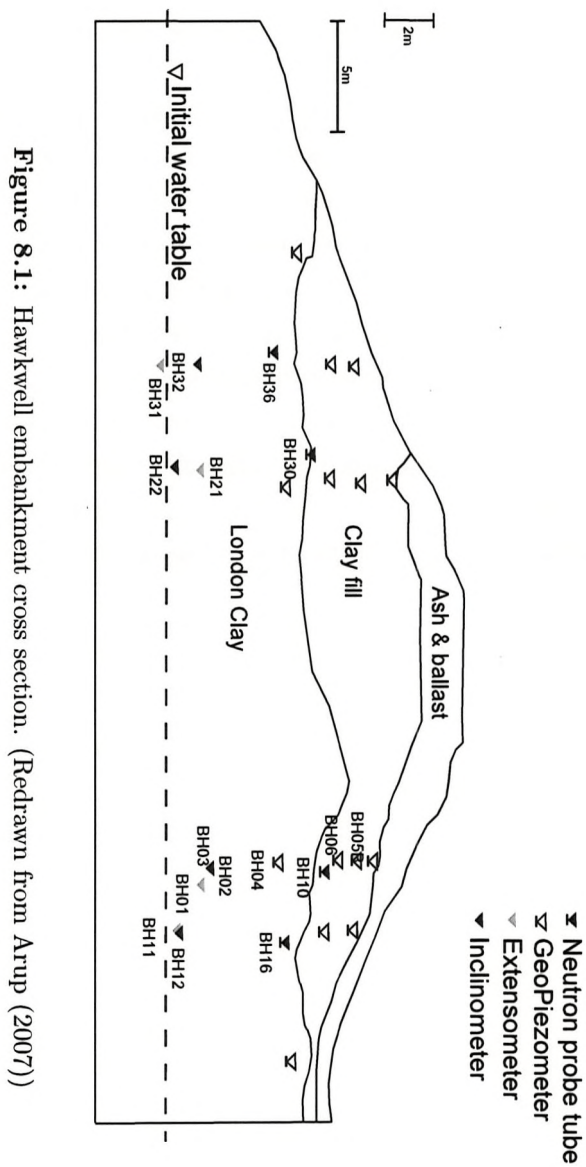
Hawkwell embankment cross section. (Redrawn from Arup (2007))
